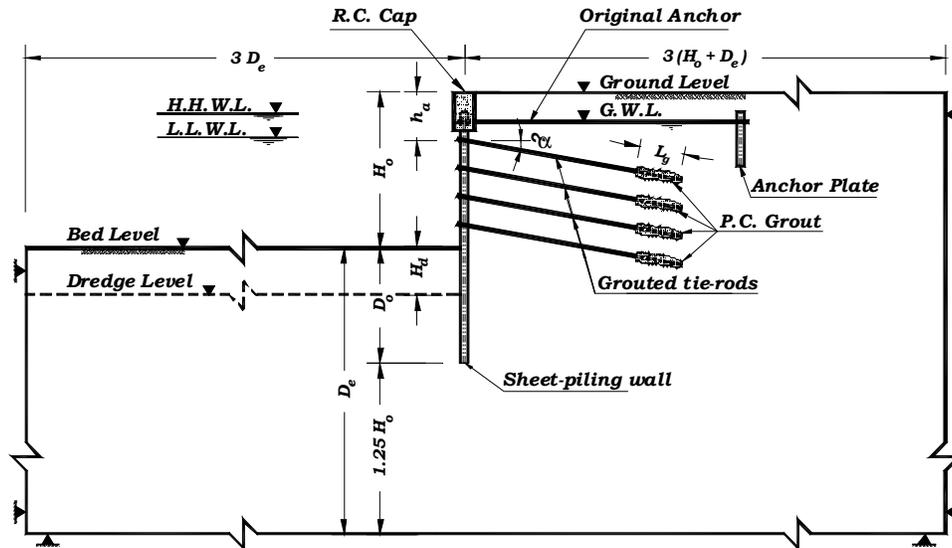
Geometry of Multi-Anchored-Sheet Pile System.
